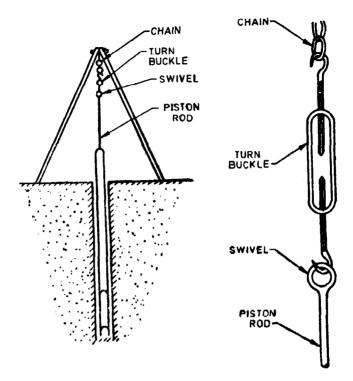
SUPPORT OF THE PISTON EXTENSION ROD
